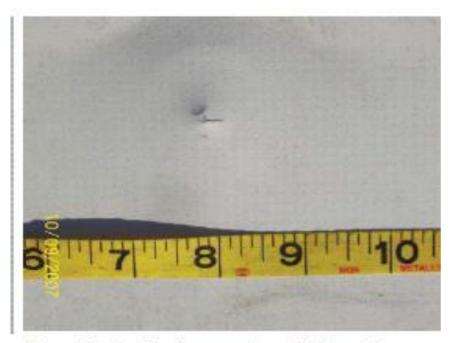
Cracking in top surface of TPO membrane at fastener head protruding up on membrane.
